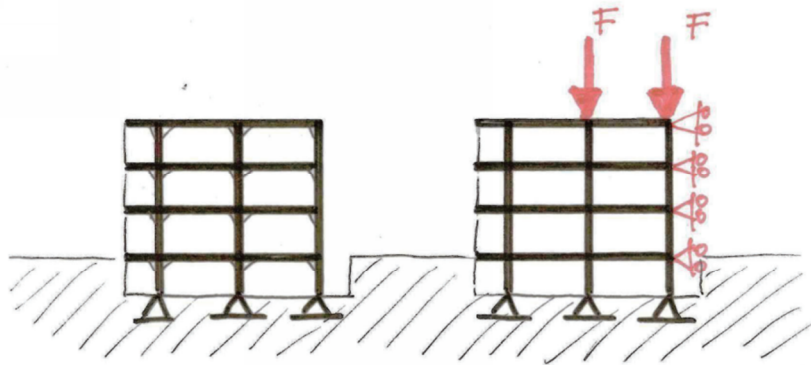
Karel Doorman - Structural stability scheme before (left) and after (right) (Hermens, Visscher, & Kraus, 2014)
